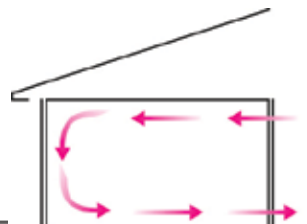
Cold Climates – Warm air would be blown up against the cold glass from floor registers located under windows. The “blown” air would rise to the ceiling and flow across the ceiling, be cooled, fall downwards, and be picked up at the bottom of interior walls by a return register.
